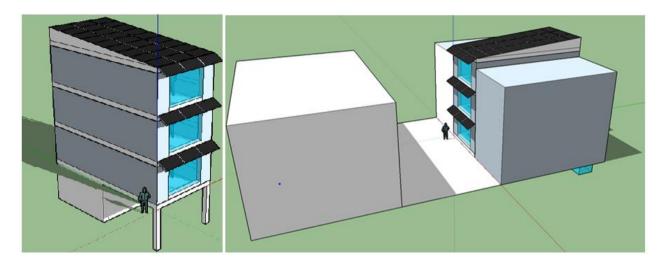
Isometric view of building (left, adjacent buildings removed) & Perspective view, with surroundings (right)
